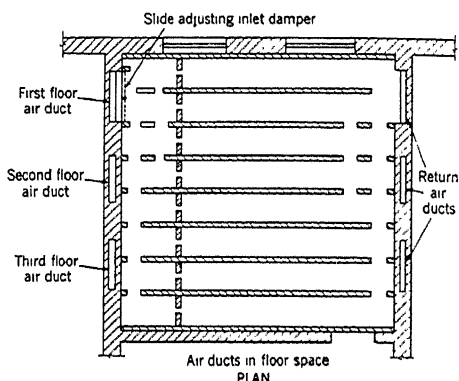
AIR DUCTS FOR FLOOR HEATING
